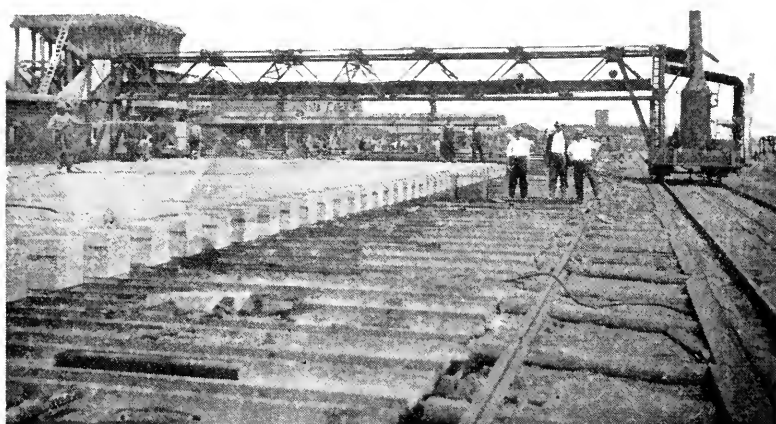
CONSTRUCTION OF CONCRETE PILES.
